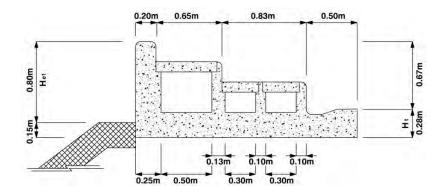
Parapet Shape of Ocean Side (Betio Side)
